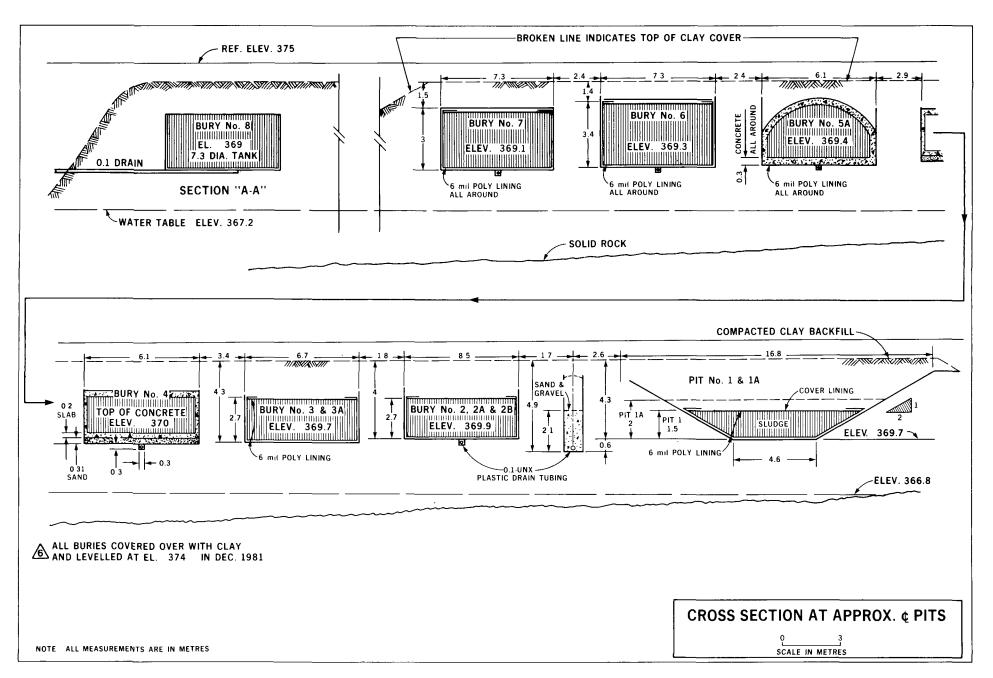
CROSS-SECTIONAL DETAIL OF BURIAL PITS - GREAT LAKE FOREST PRODUCTS LTD., DRYDEN
